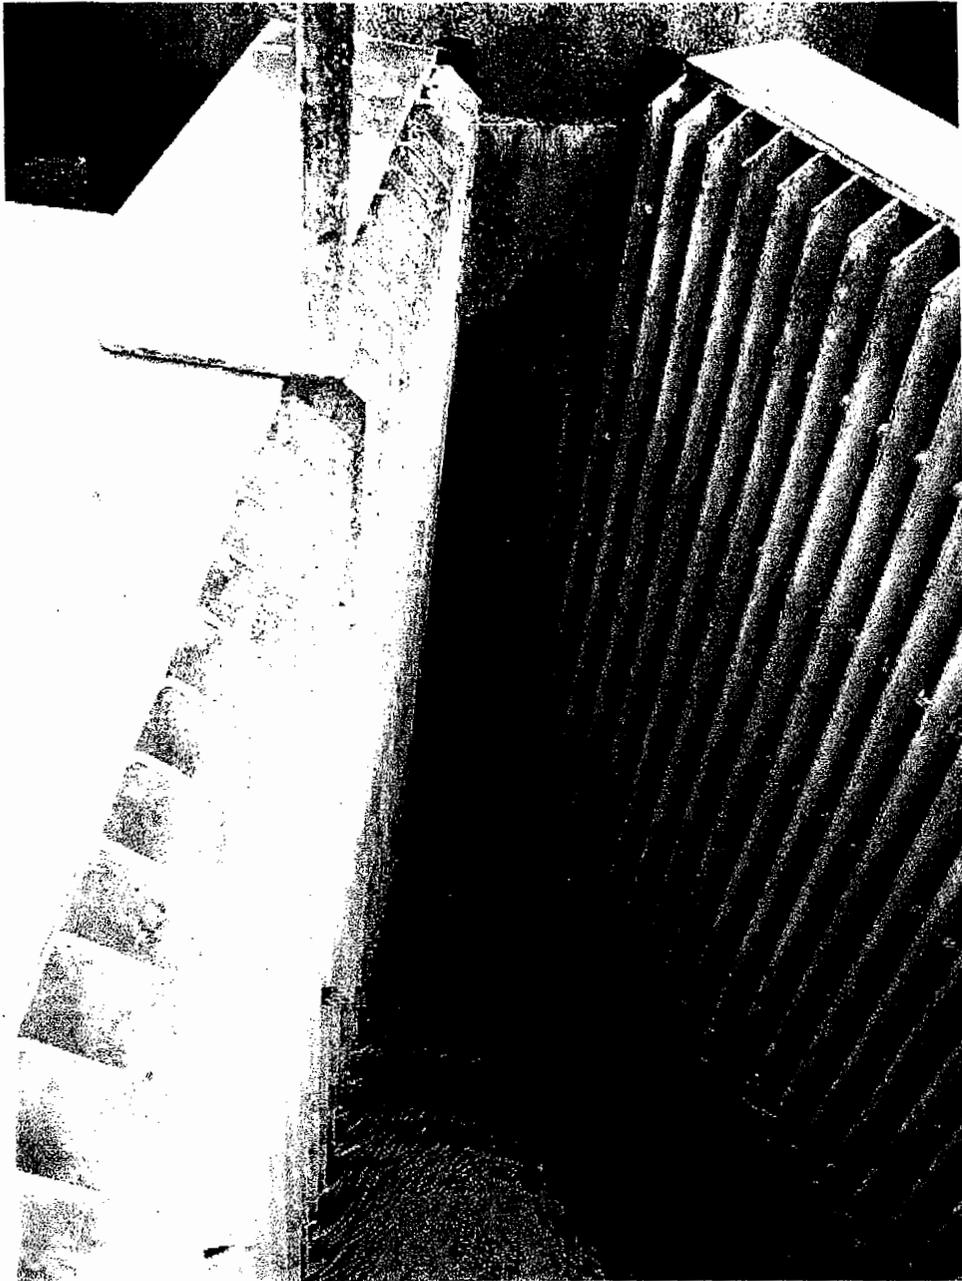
Bypass Entrance Slot and Louver Detail from U/S
